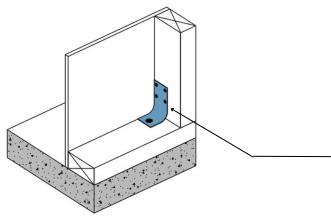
CONCRETE FLOORS • EXTERNAL WALLS • GIB HANDIBRAC<sup>®</sup>
